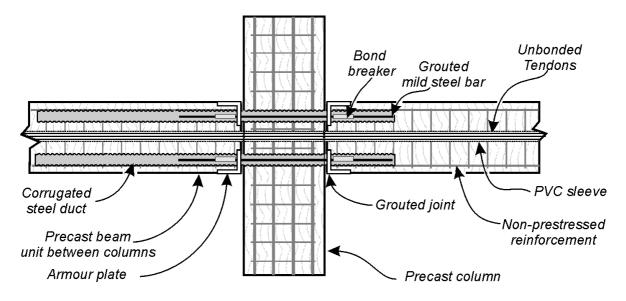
Section through a beam-column assemblage of a hybrid frame system
